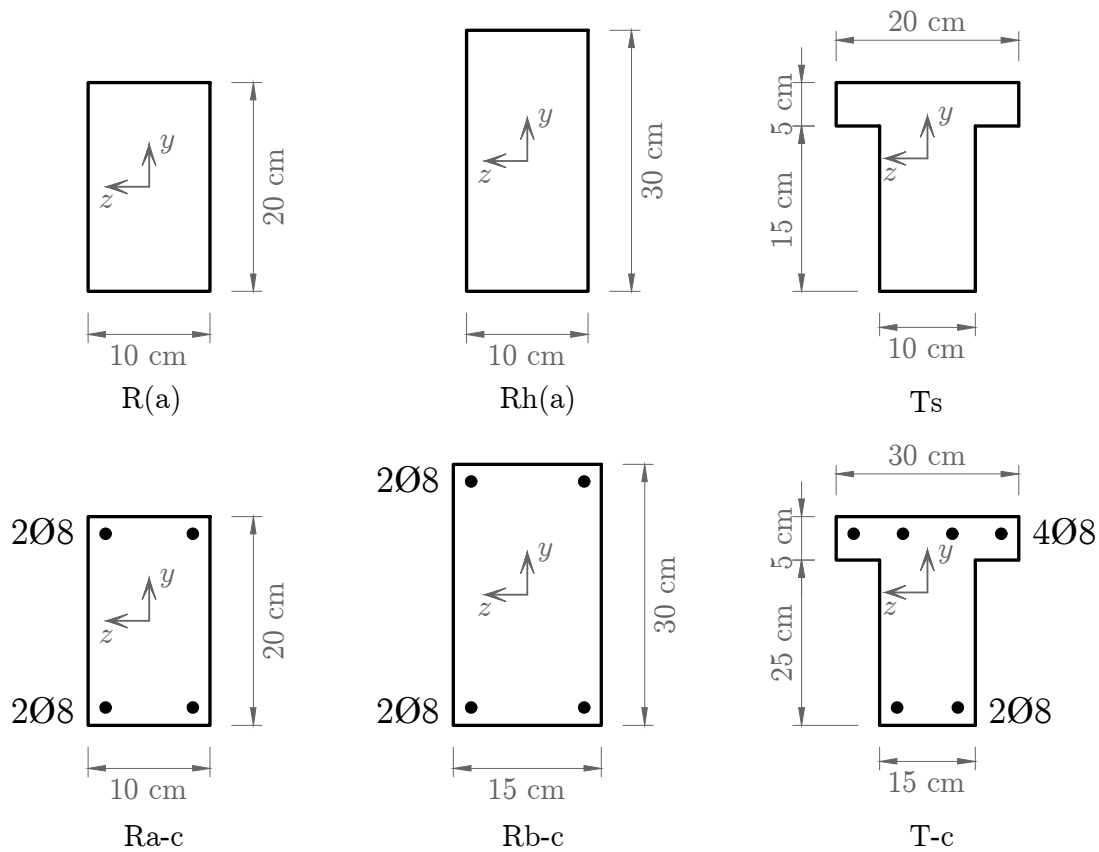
Beams subjected to end torsional loads: specimens geometry.
